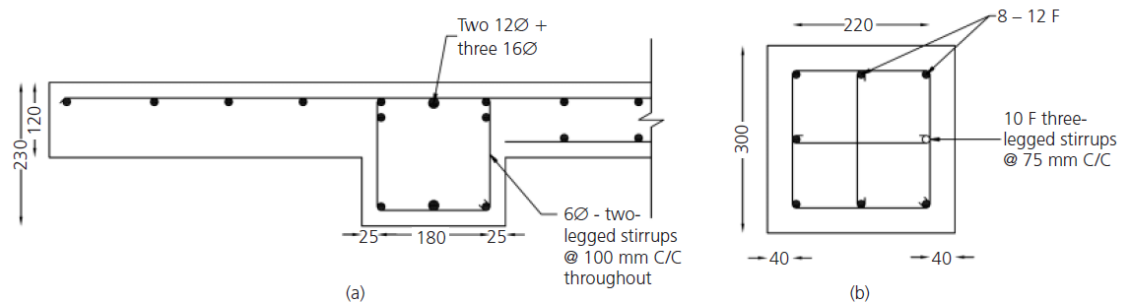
Details of (a) beam and (b) column reinforcement (dimensions in mm)
